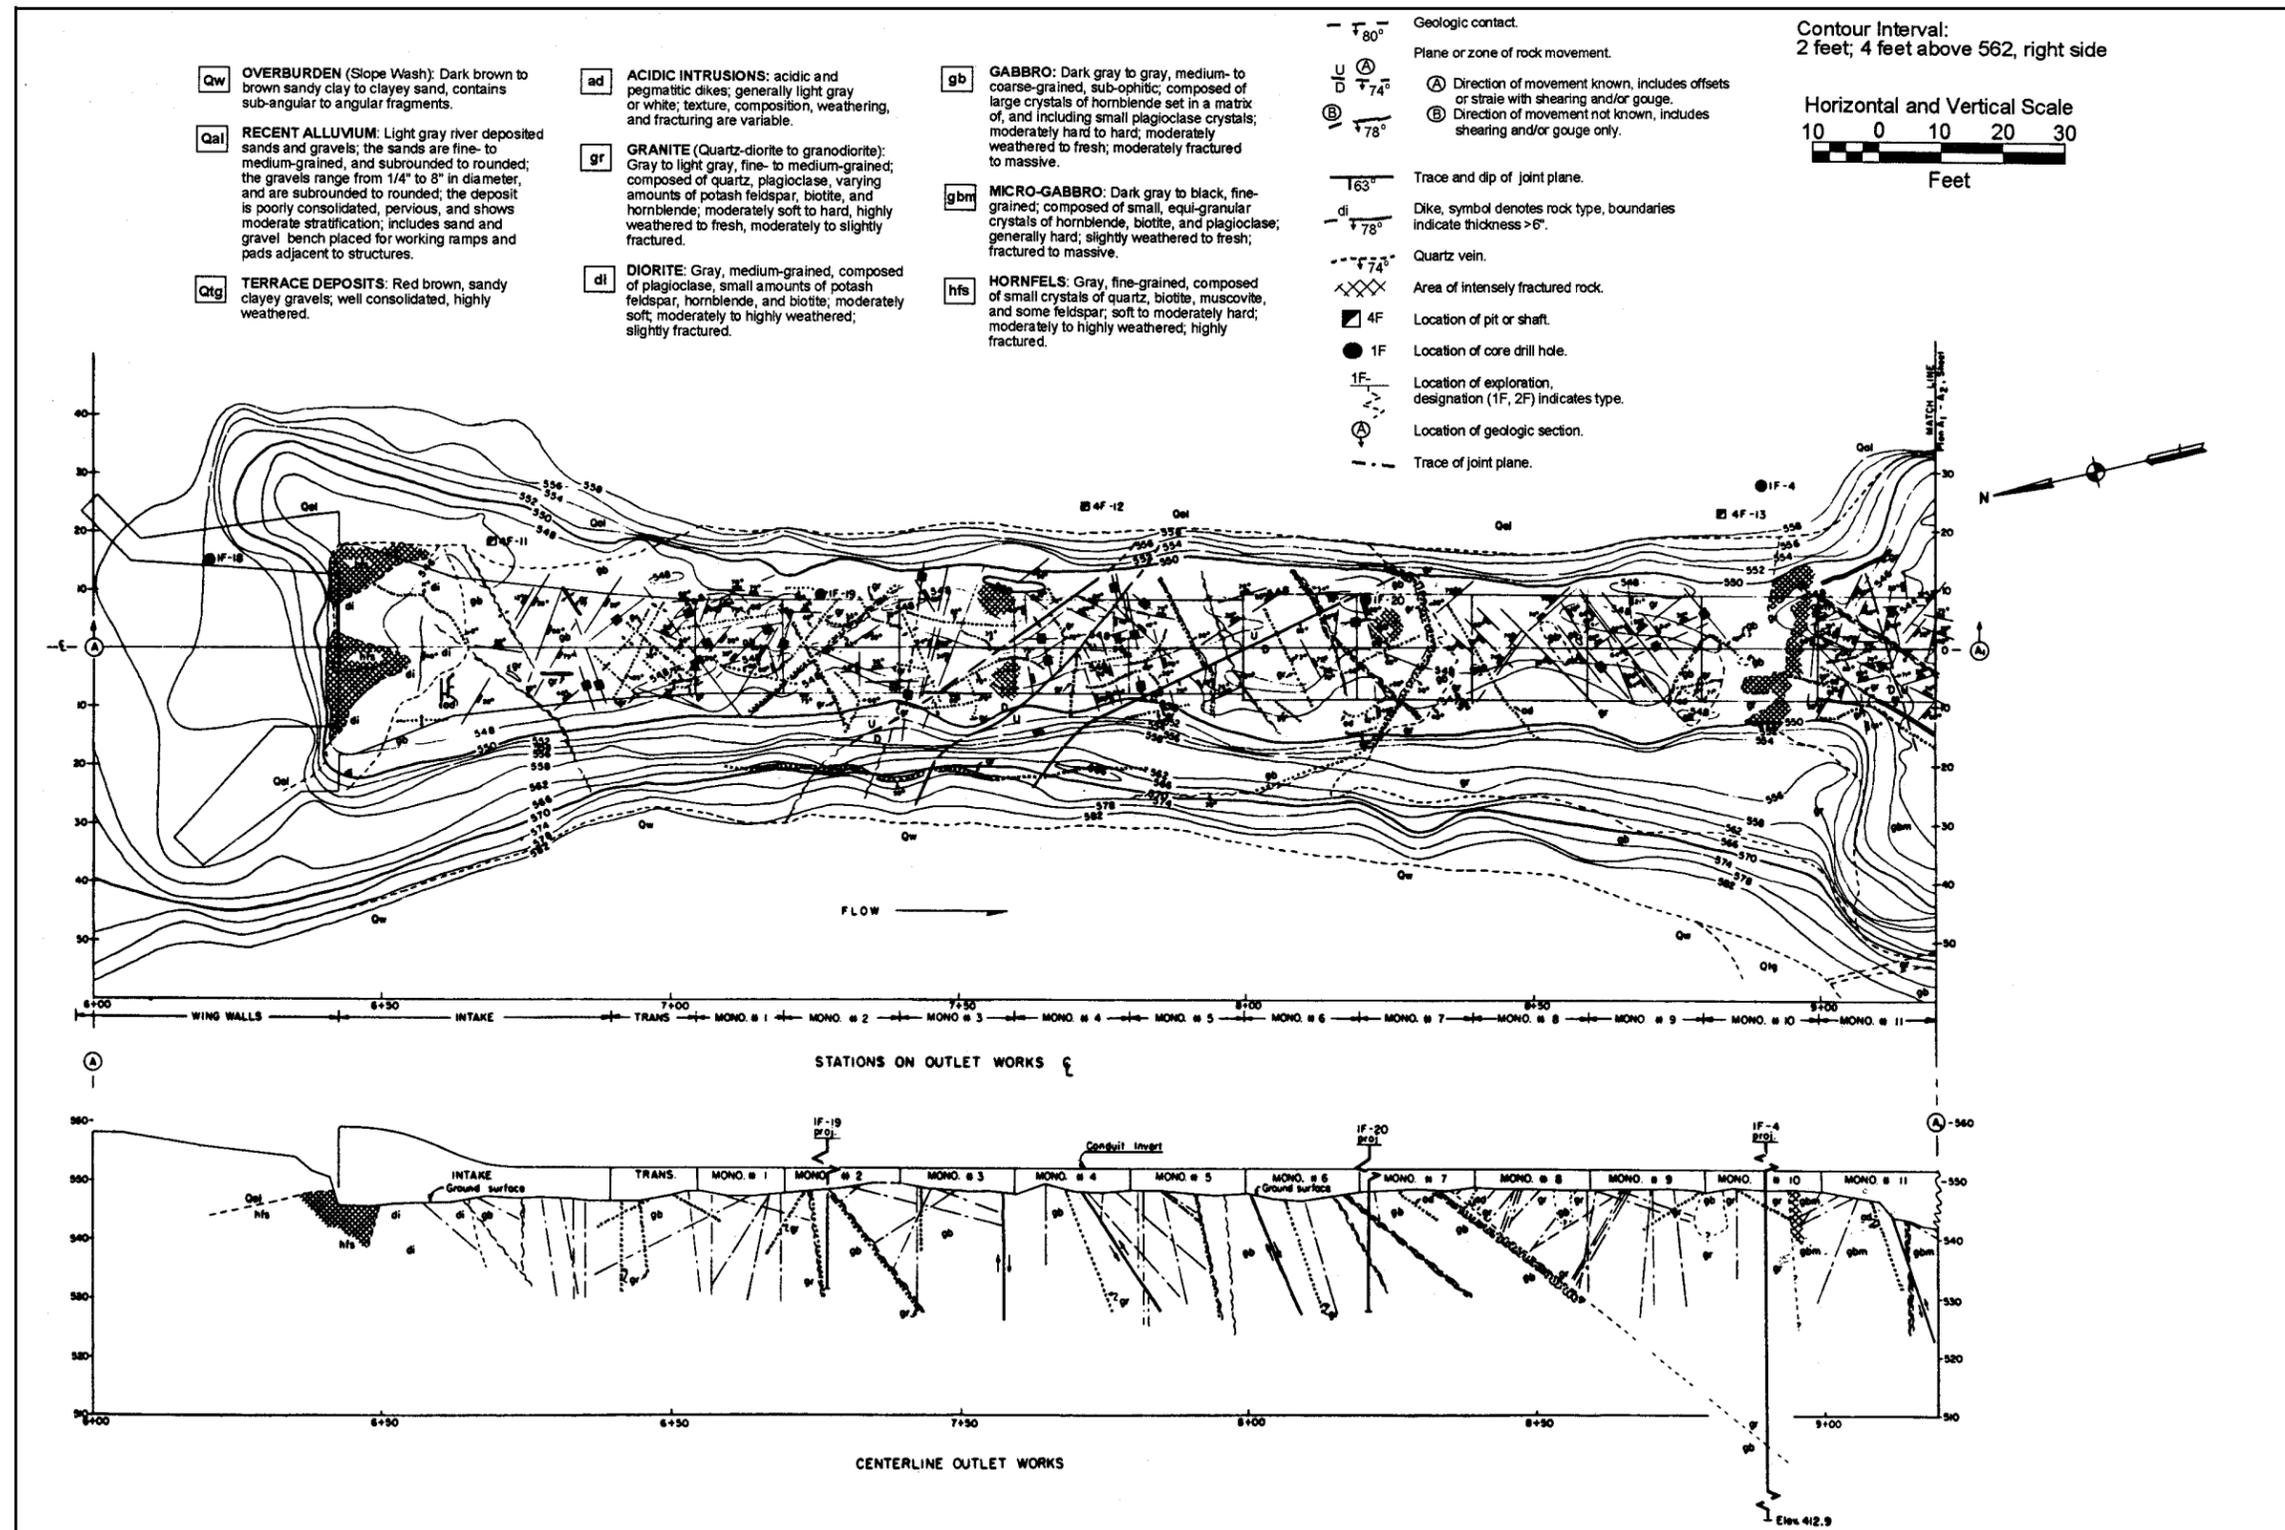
Example of a foundation map for concrete structure on metavolcanic and igneous rocks
